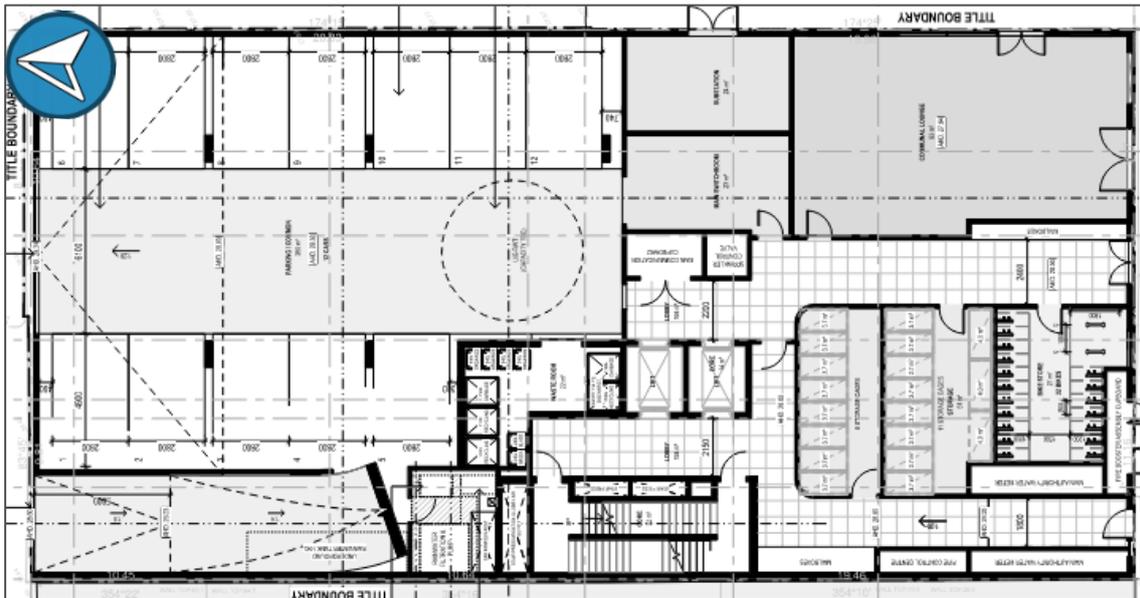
Proposed Ground Floor Plan (Image Source: Cera Stribley)
